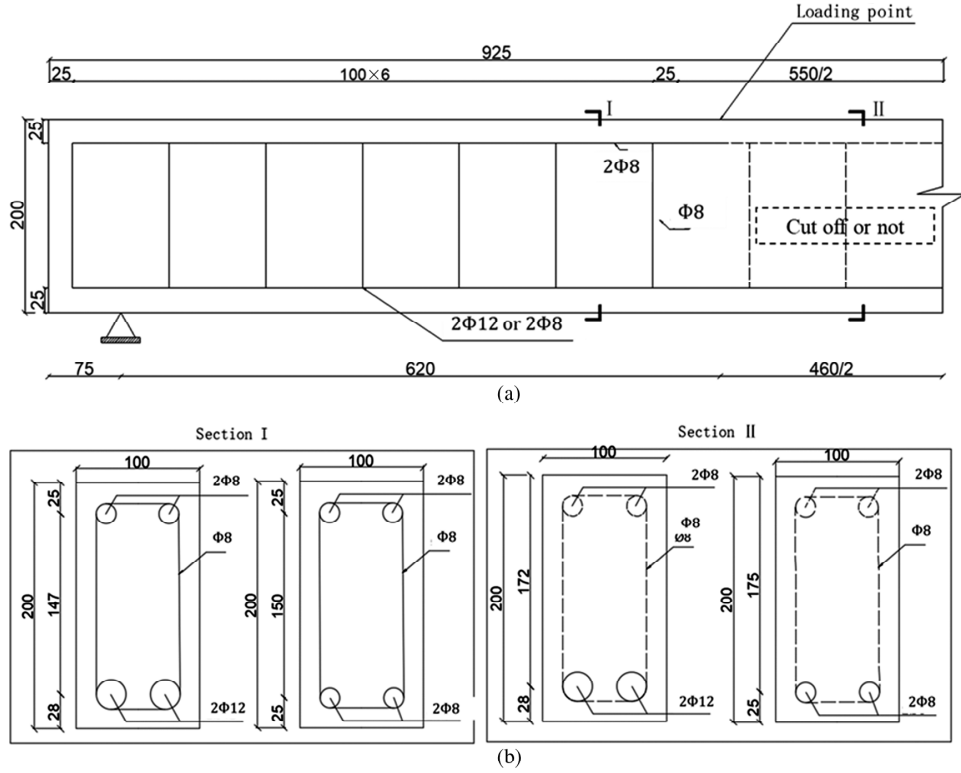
Diagrams of the reinforced concrete test beams (unit: mm): (a) elevation drawing and (b) sectional drawing.
